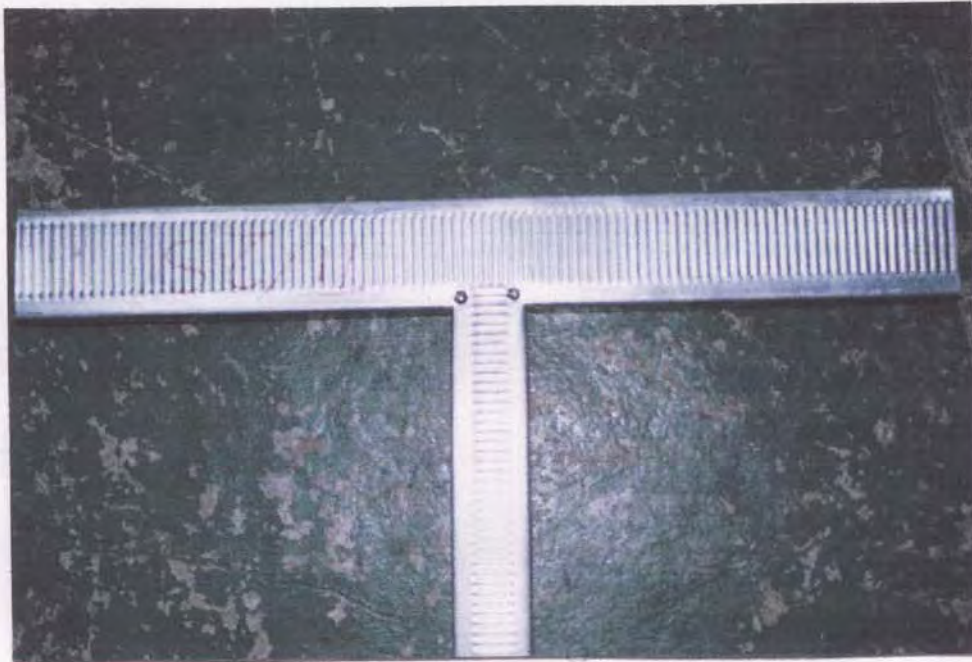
After test – sample T1/2S (pulling test with 2 screws)
